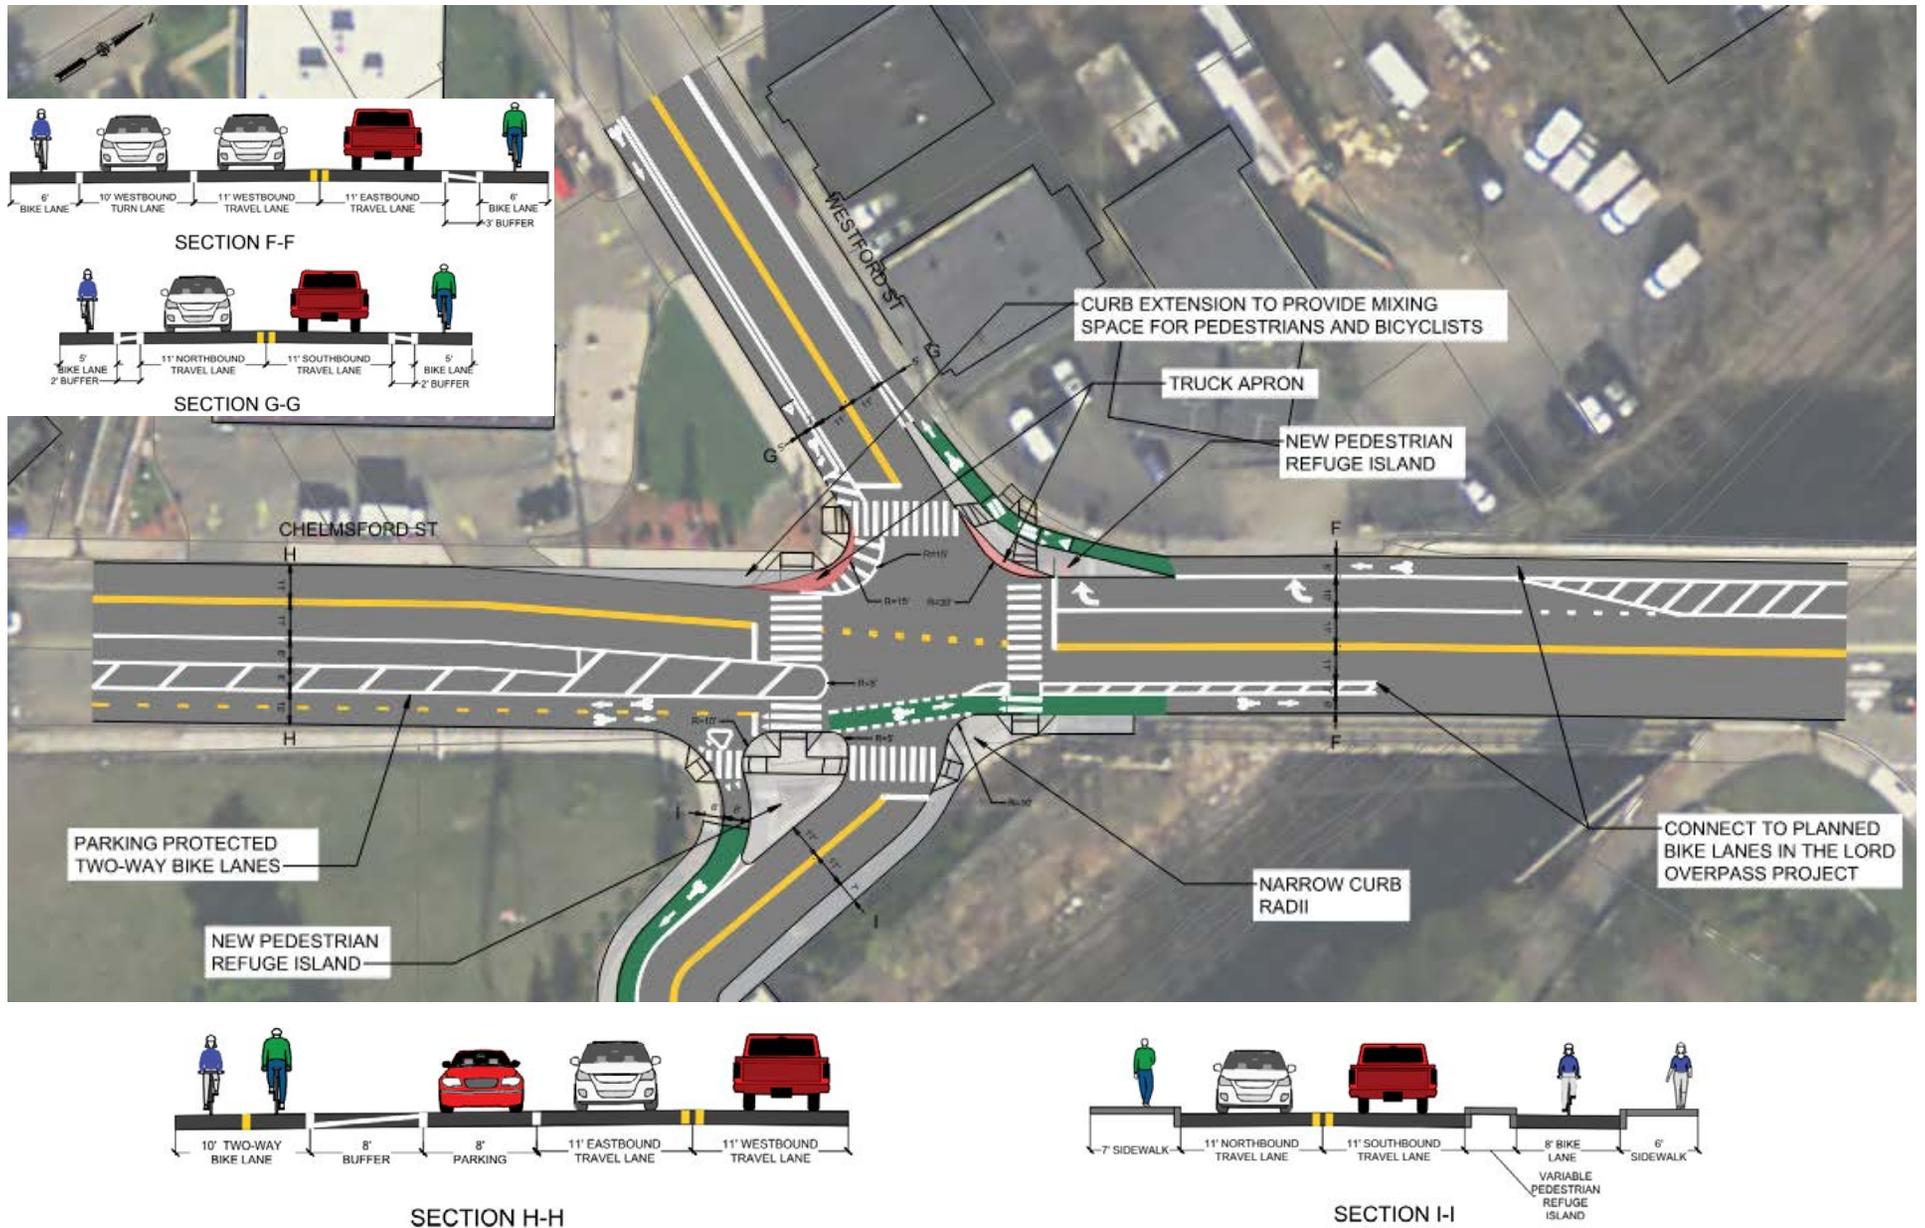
Intersection Concept Plan for Chelmsford Street at Plain Street
